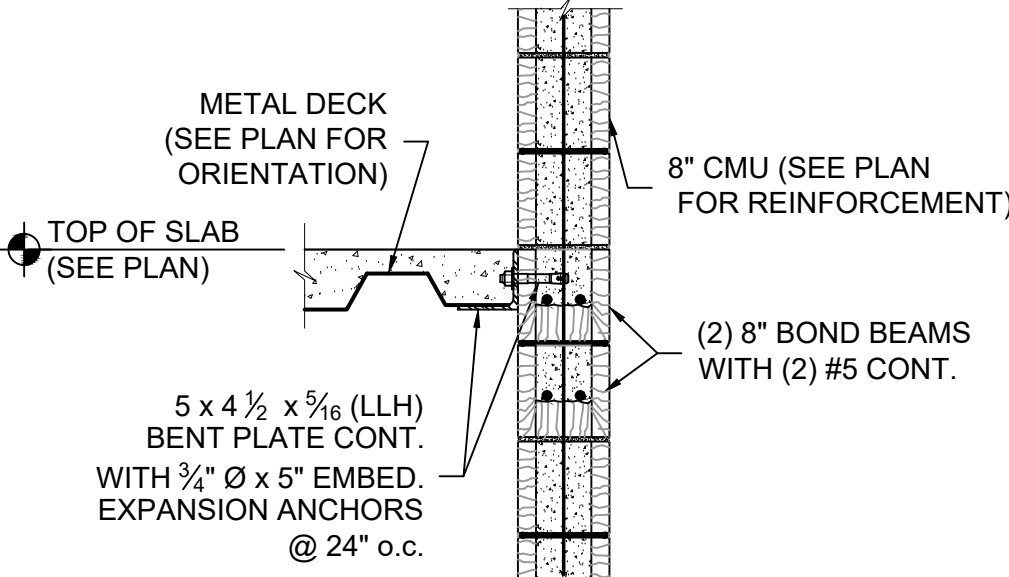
DETAIL OF TYPICAL REINFORCED CMU WALL CONSTRUCTION 1
